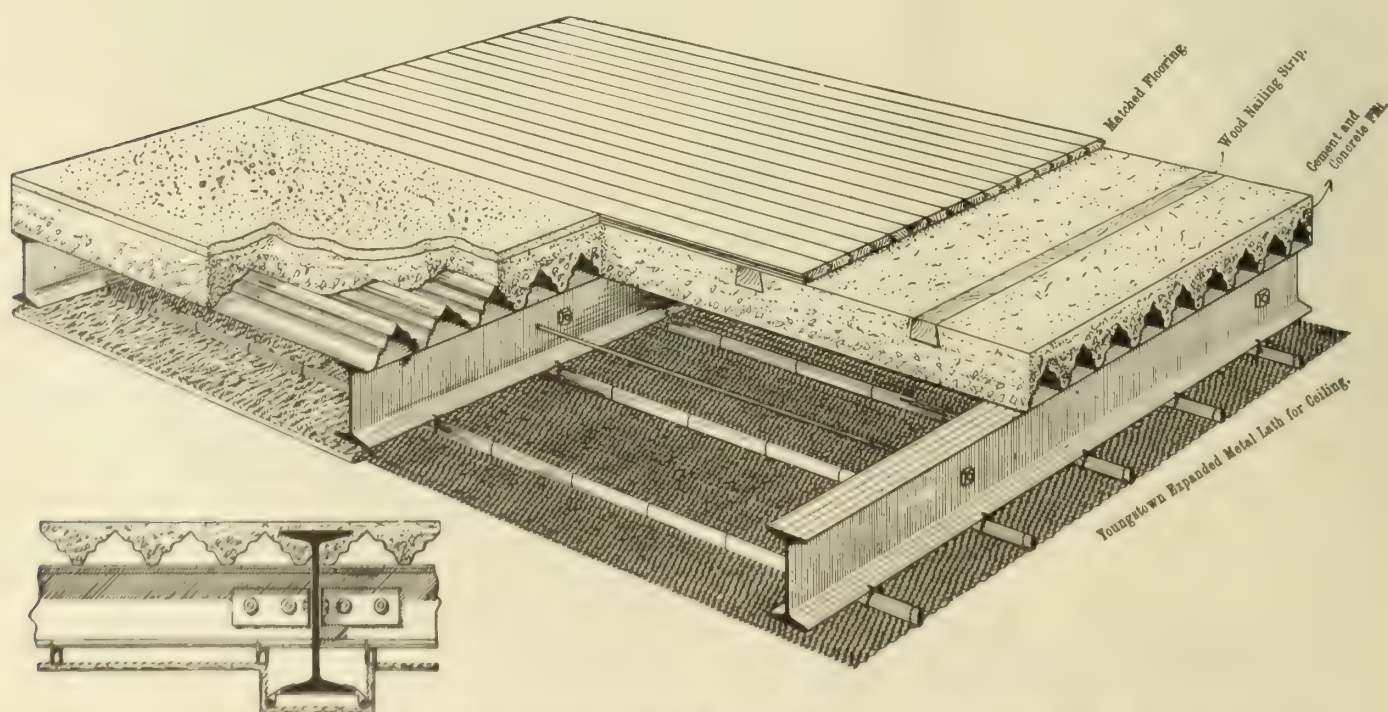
DETAIL OF "BUCKEYE" SYSTEM OF FIREPROOF FLOOR CONSTRUCTION
